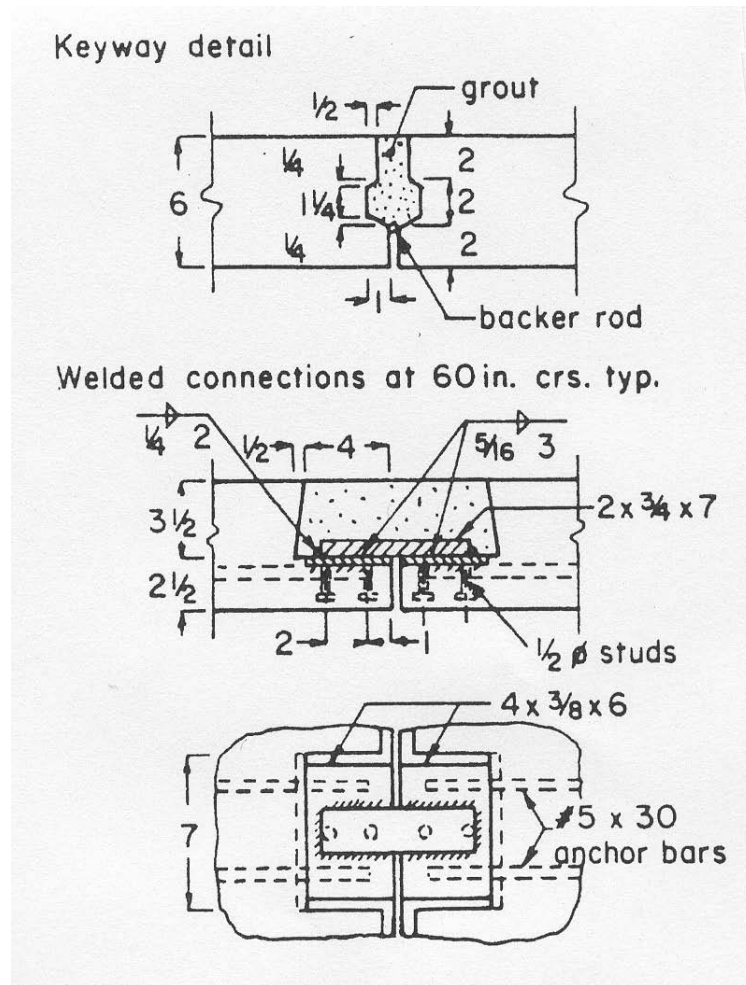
Typical Connection Detail Used by Stanley Structures, Denver, CO
